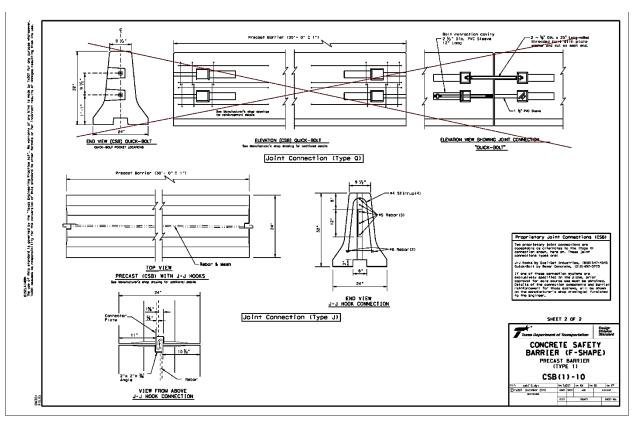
Detailed Drawing of Connections for Barriers Used during Testing.
